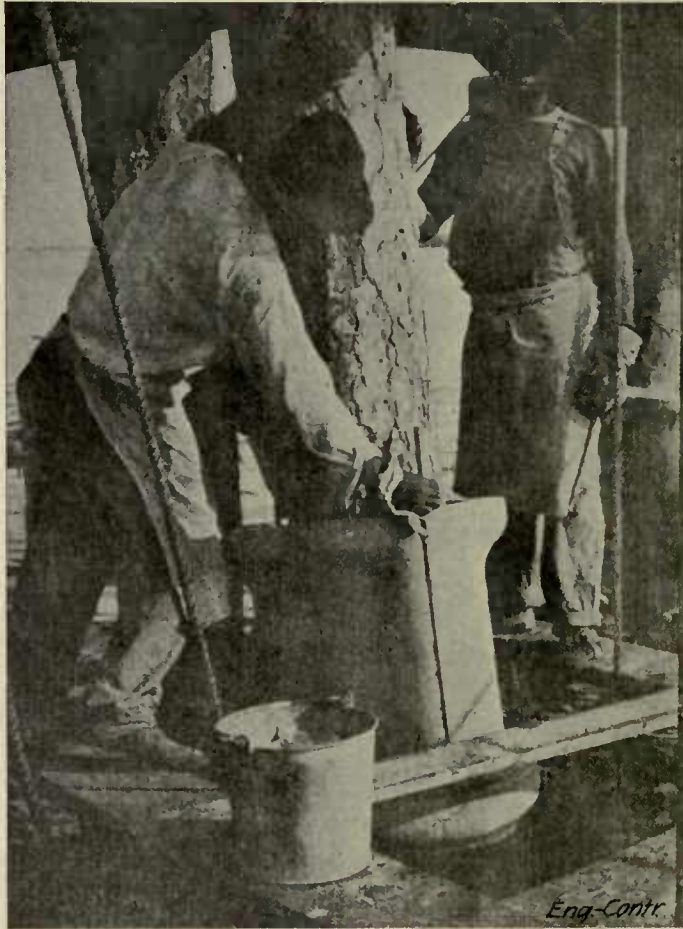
VIEW SHOWING METHOD OF APPLYING PIPE TO PILES.
